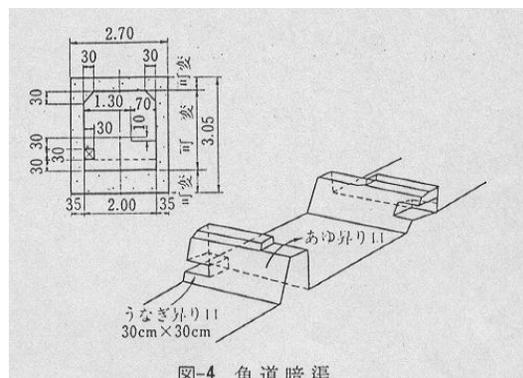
Culvert Structure of the Fish Ladder (When Originally Constructed)
